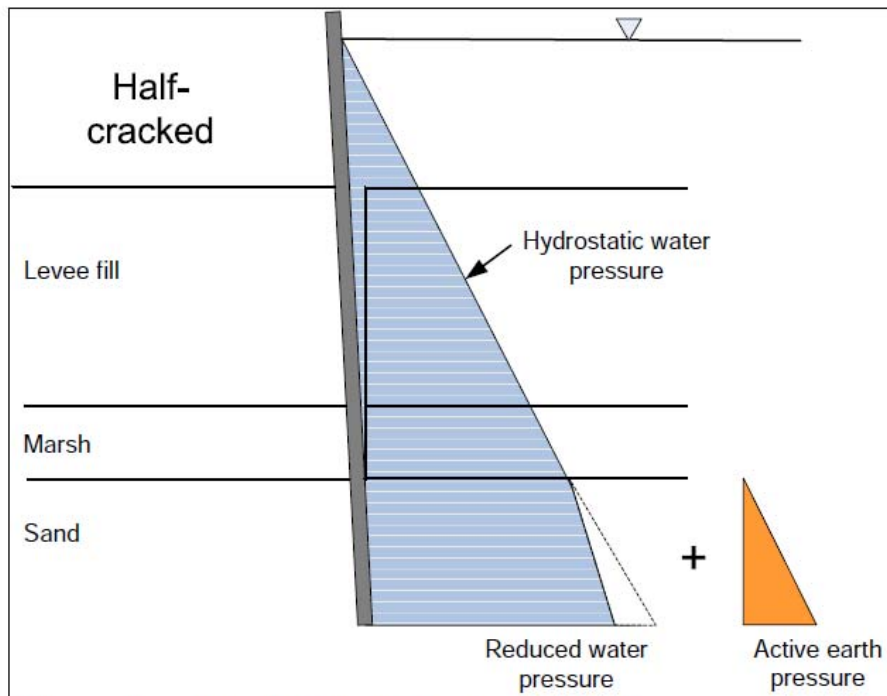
Schematic of Crack Used in London Avenue Canal Stability Analyses
